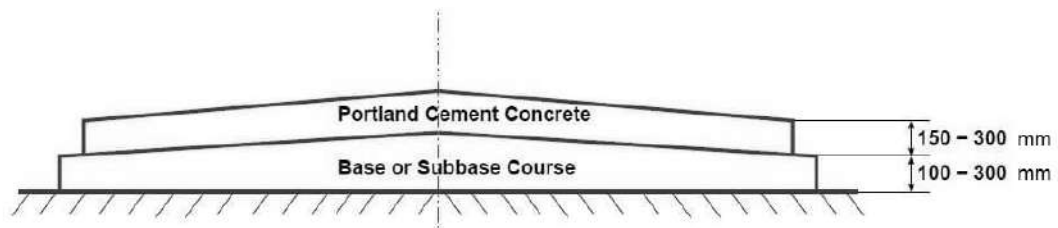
Typical Cross section of rigid pavement (Mathew, 2009)
